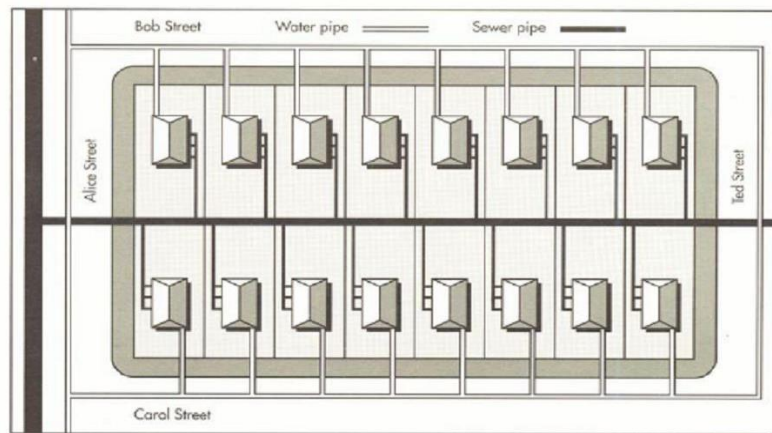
Layout of a Typical Conventional Gravity Sewer (Source: Dr. Eddy Akinyemi -ppt)
